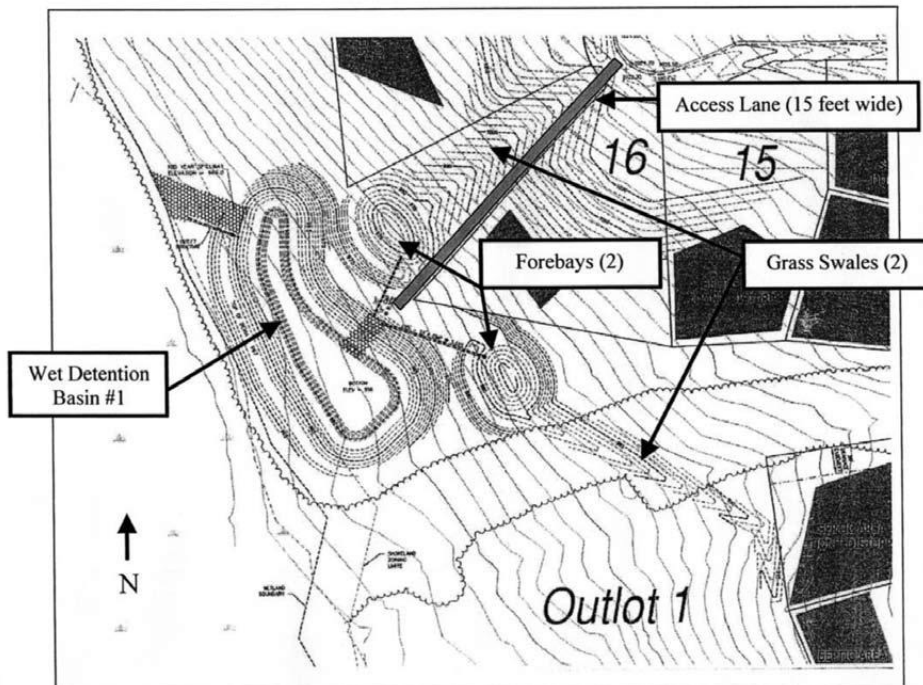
Exhibit D – Storm Water Practice Maintenance Plan (Sample)
